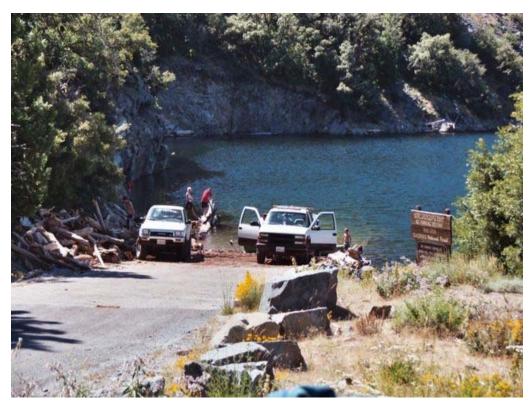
Top of Hell Hole Boat Ramp as viewed from near Hell Hole Boat Ramp Parking Area. Reservoir is almost at maximum operating WSE of 4,630 feet. Note transition from top of concrete ramp to asphalt pavement (date of photo unknown, WSE ~ 4,628).
